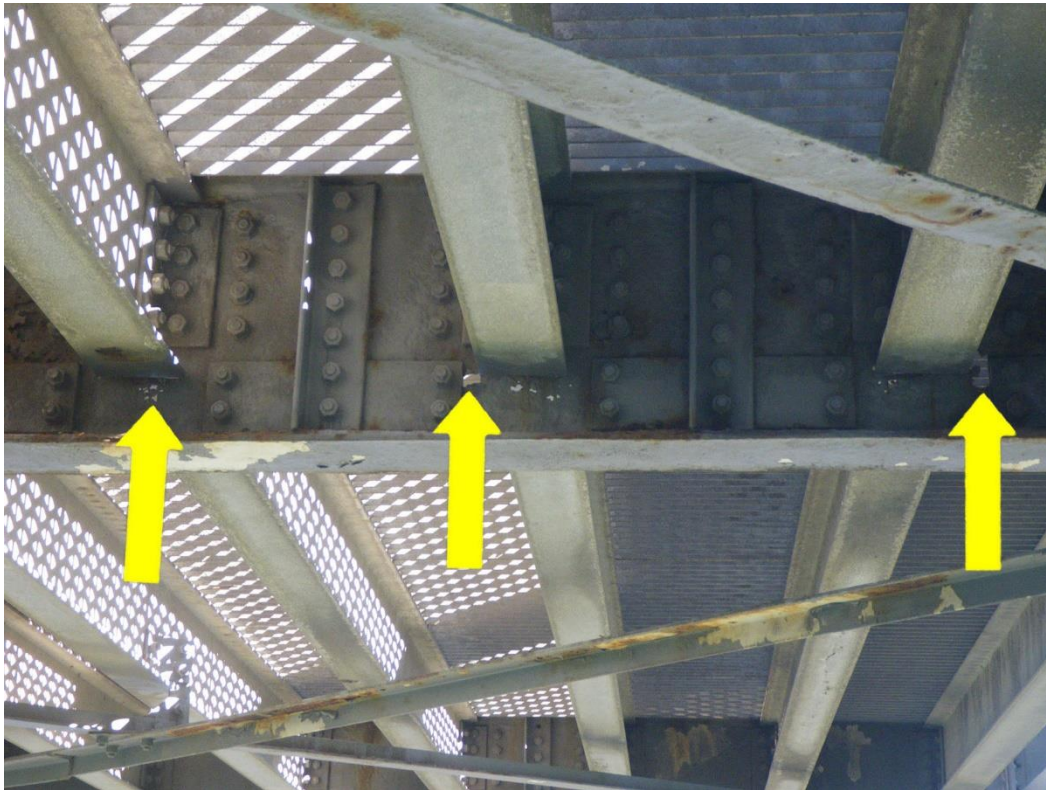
Floorbeam FB2S btwn Stringers S2 & S4, South Face, Span 4 - Web section loss below stringer connections including areas of 100% section loss. Note repair plates not covering 100% section loss & failed paint system.
